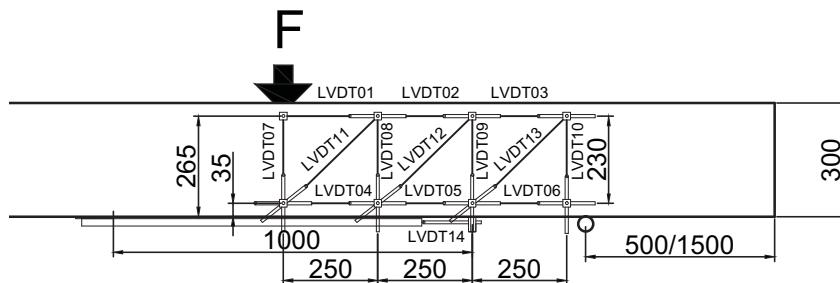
LVDT layout and numbering for 300 mm deep beams
